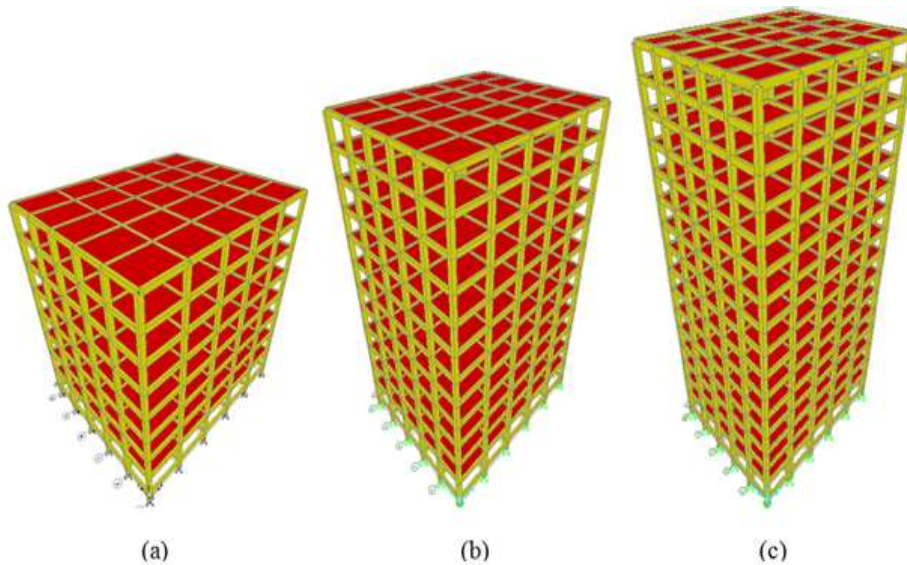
3D view of (a) 8 storied (b) 12 storied (c) 16 storied buildings.
